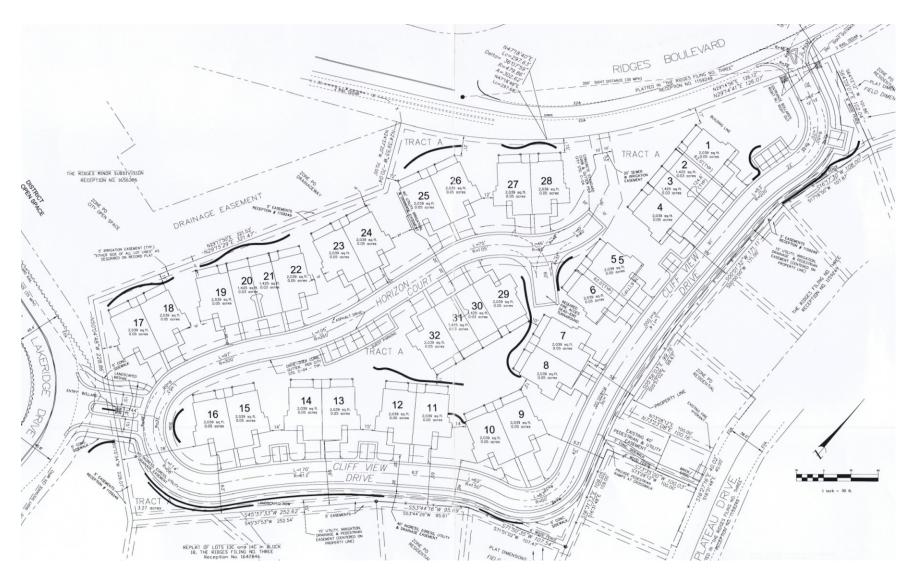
EXHIBIT A: SHADOW RUN AT THE RIDGES PLANNED DEVELOPMENT PRELIMINARY DEVELOPMENT PLAN
